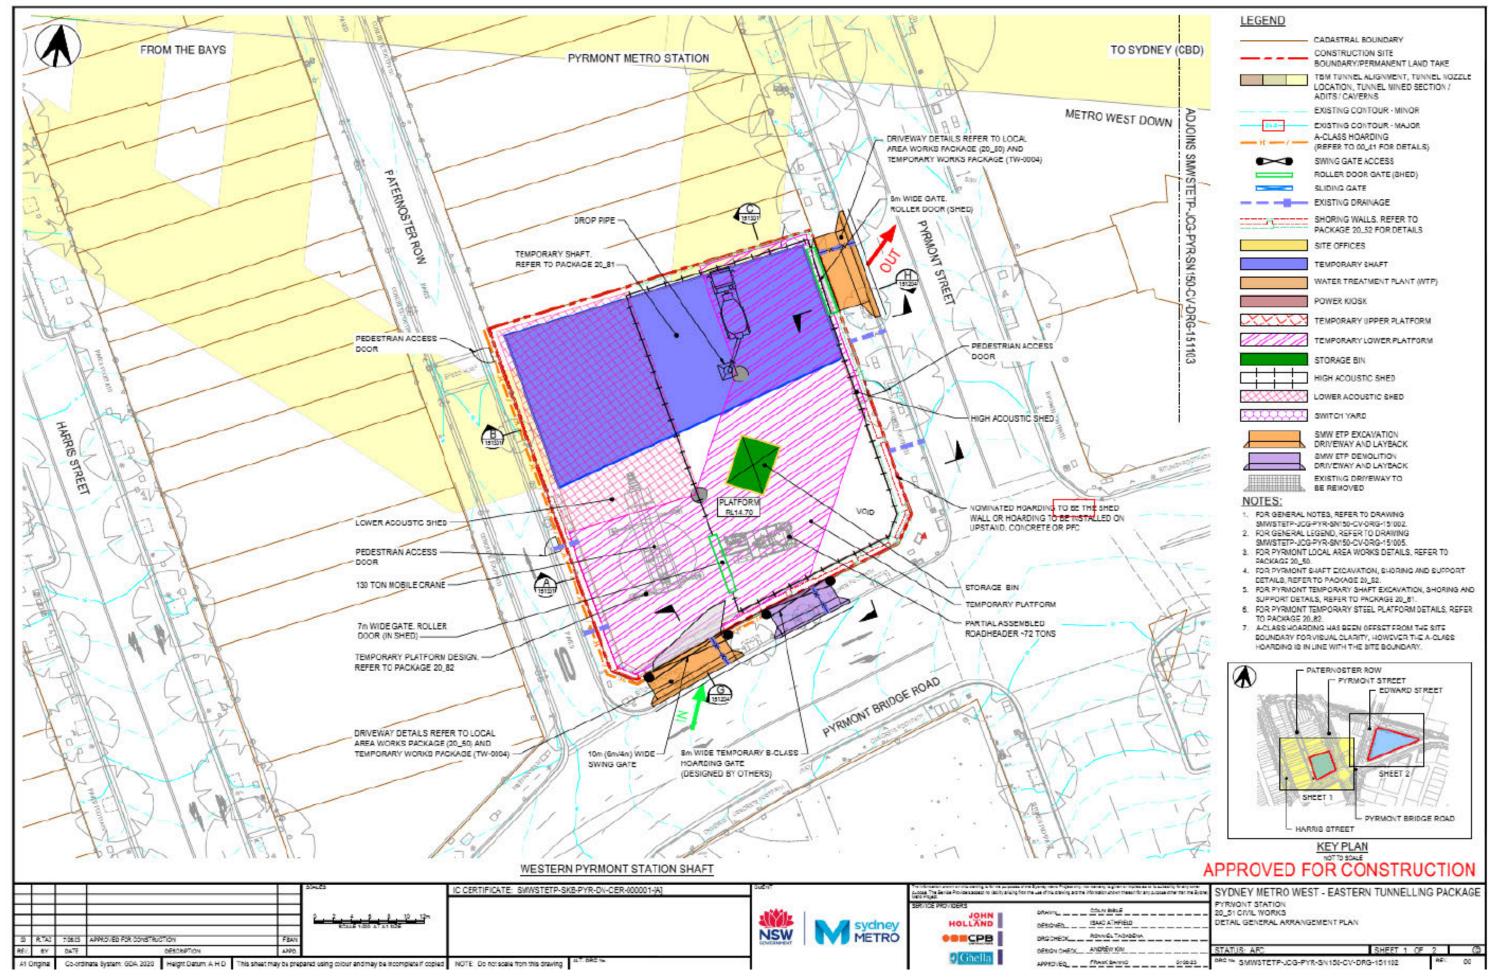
Site Layout and Hoardings (Stage 2)
